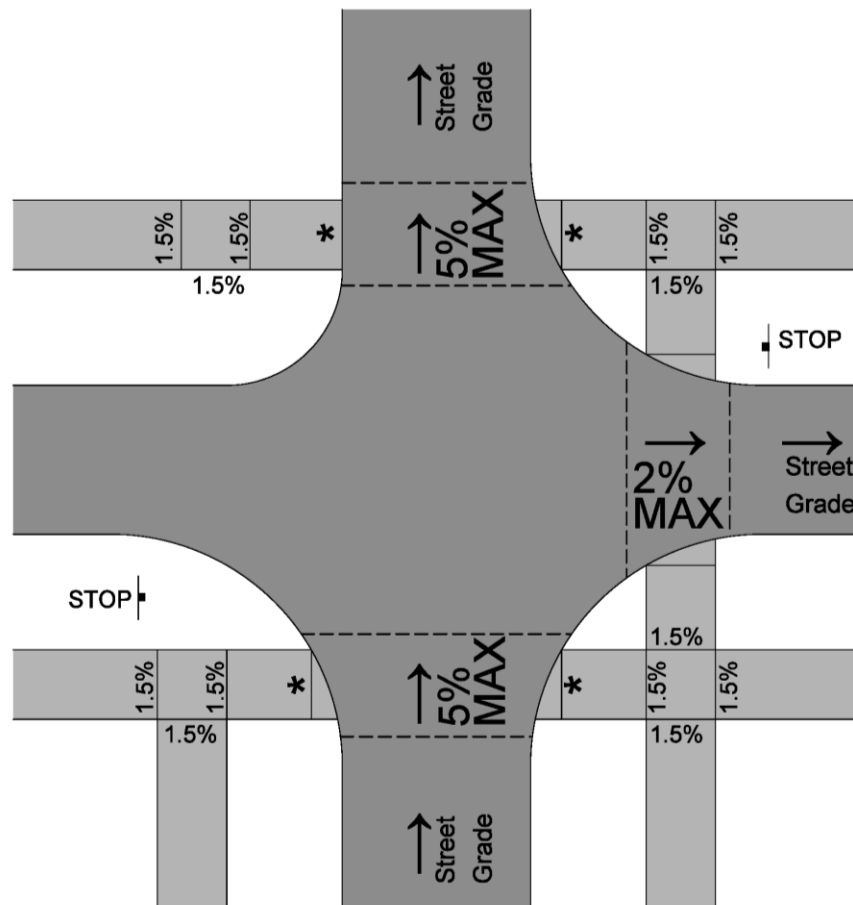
A-2.03: Standard Sidewalk and Curb Ramp Elements
